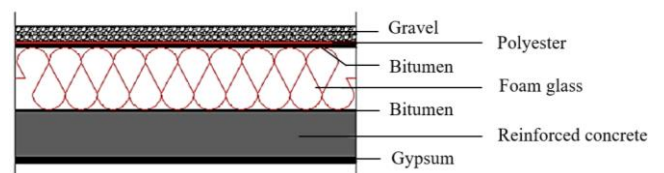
The converted roof construction cross section. By adding a thermal insulation layer (foam glass), the wall construction is improved. furthermore, it, The bitumen 2 layers' act to a vapor barrier. The wall thermal transmittance is improved until its reach to 0.18 W/m<sup>2</sup> C.
